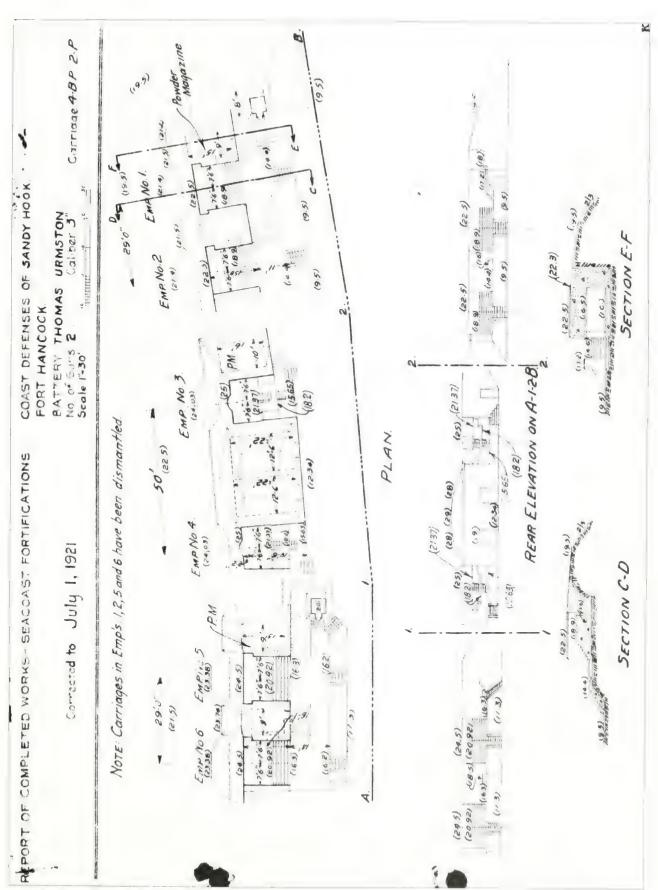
Plan, elevation, and sections of Battery Urmston, 1921. The final phase of construction at Battery Urmston, completed in June 1904, built two emplacements between the two previously finished sections (Report of Completed Works, CDSG ePress).
